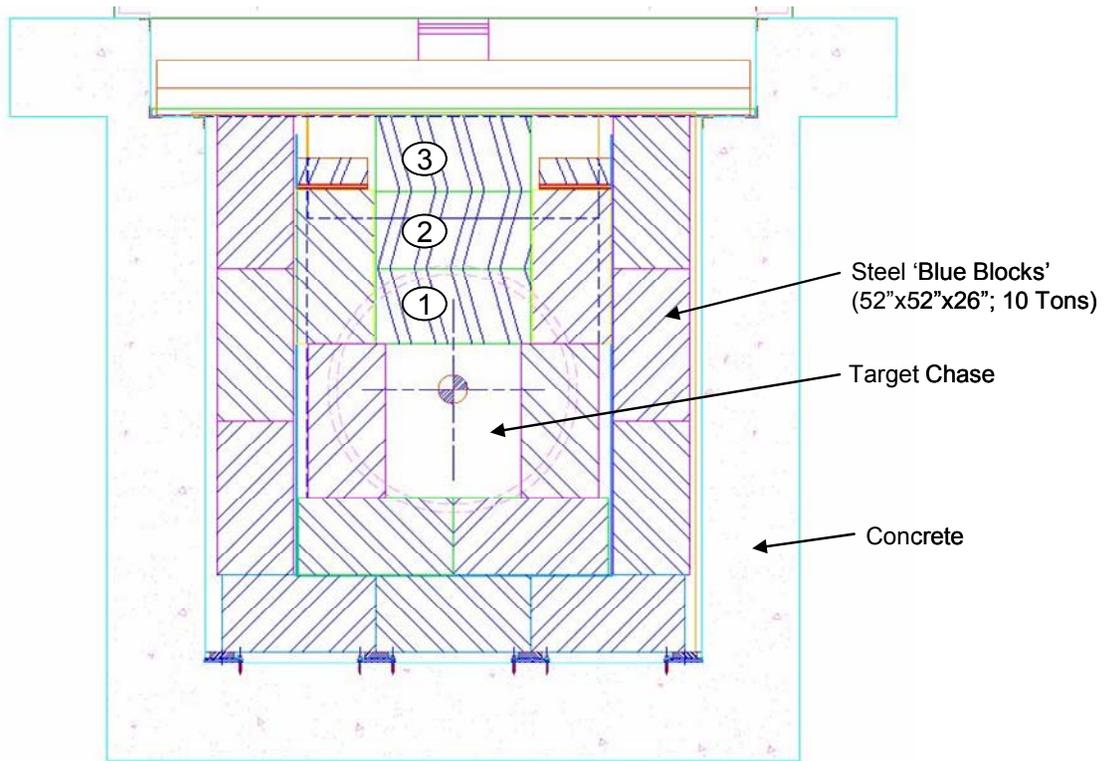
Typical NuMI Target Hall shielding cross section. At the new Horn 2 position, only the center row of blue blocks (marked 1, 2, & 3) will have to be removed.
